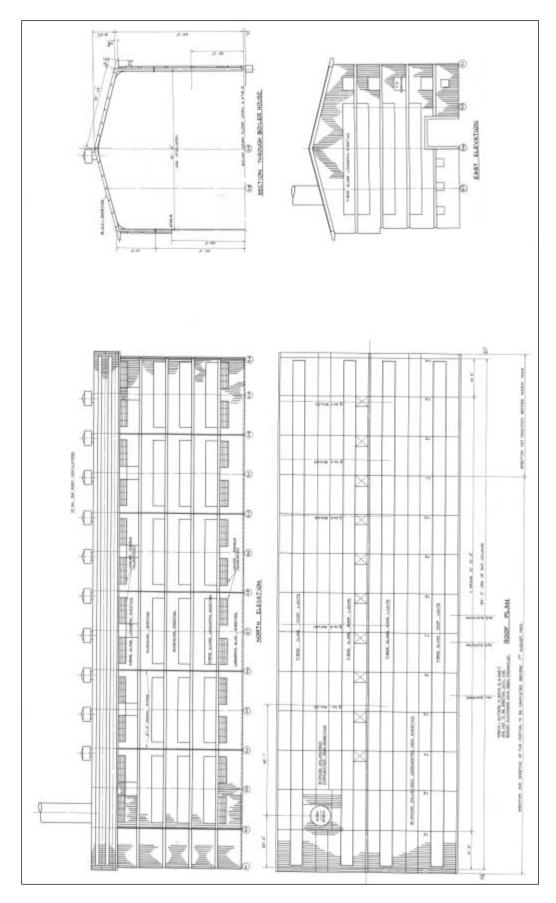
Plan of the "new" boiler house. The plan was signed on 16 February 1962 (Rand Water Board, Technical Drawings, Plan 4105).
